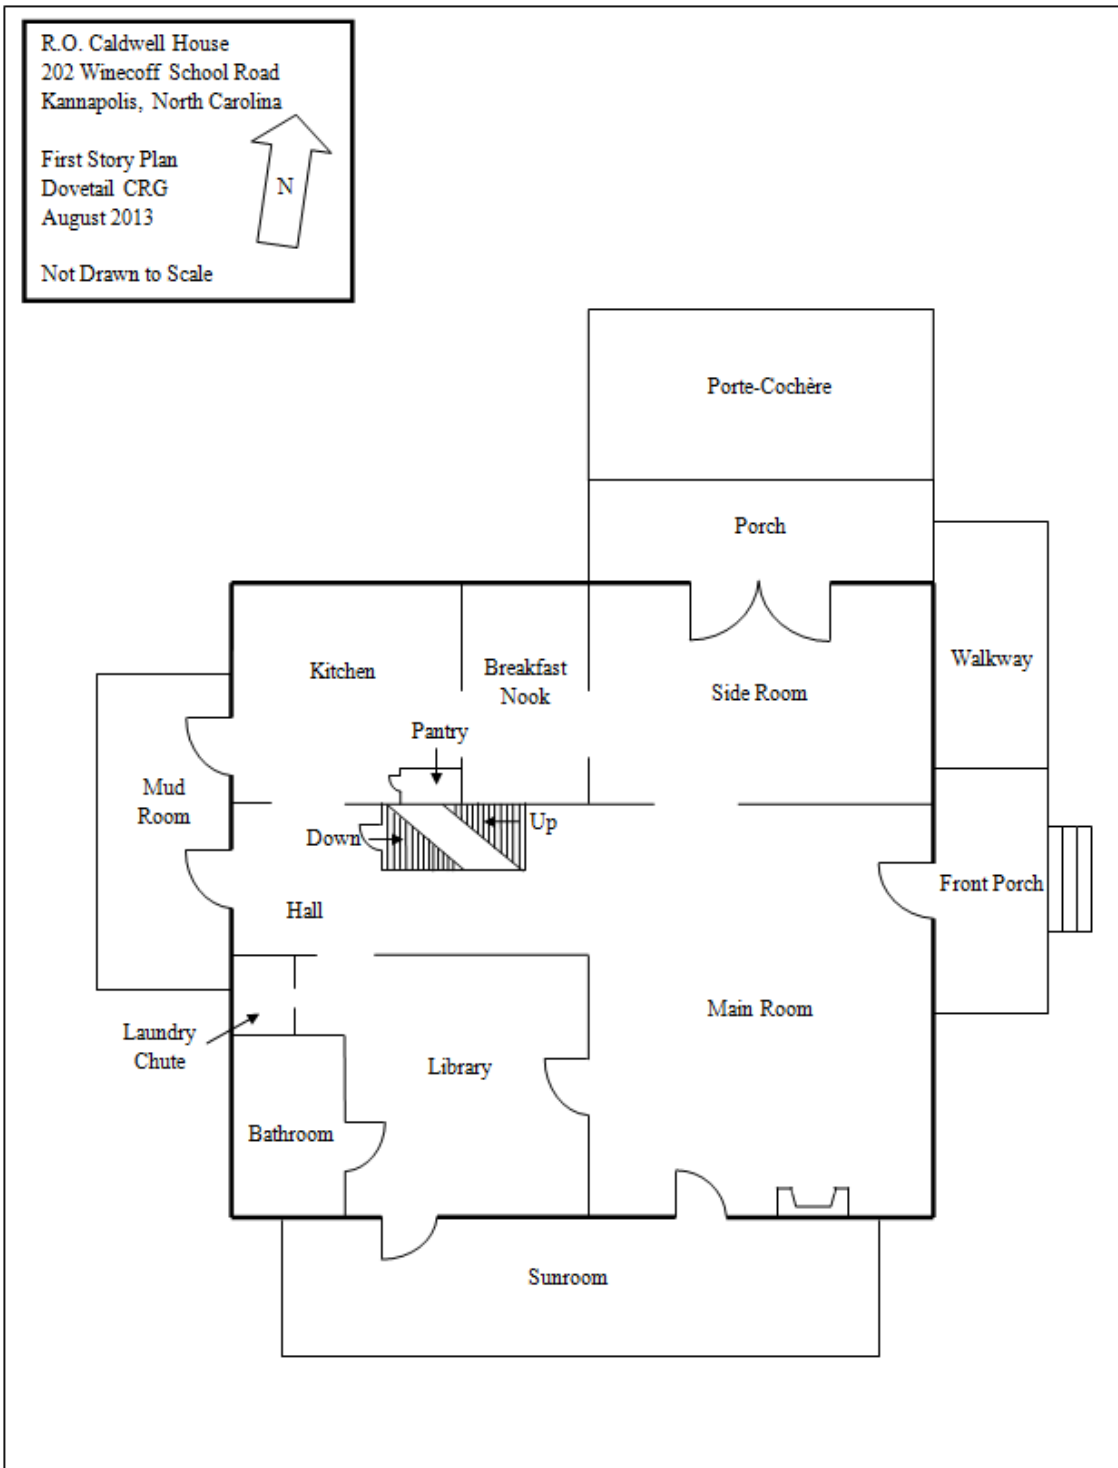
First Story Plan of the R.O. Caldwell House (CA 423).
